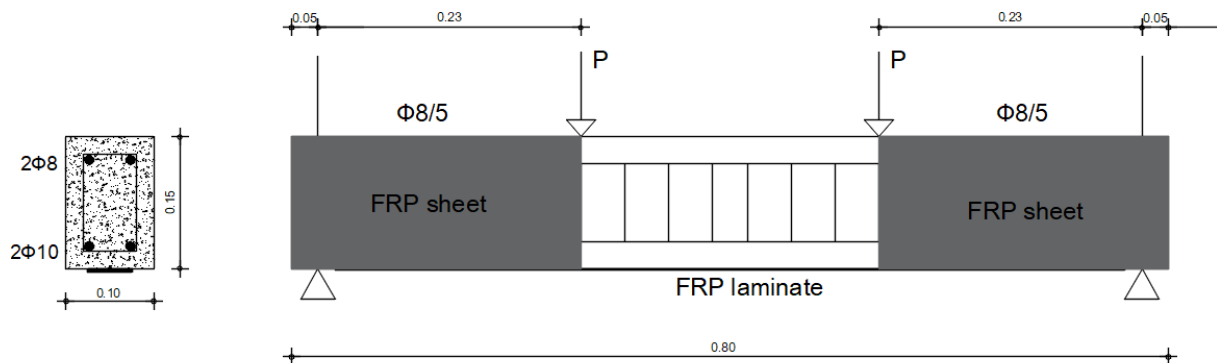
Concrete beam geometry, detailing of reinforcements, and FRP geometry
